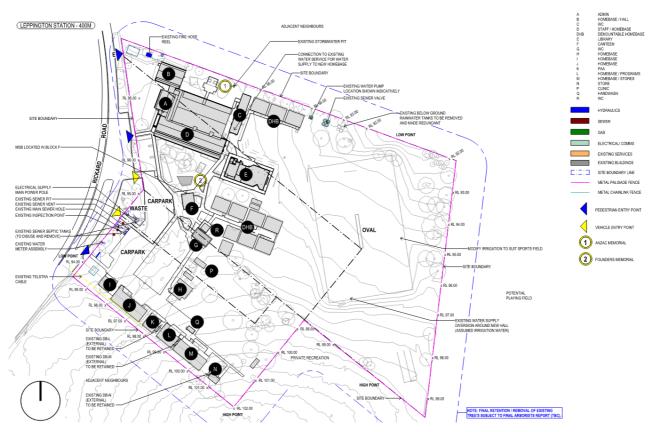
Existing improvements at subject site (Source: Pedavoli Architects)
